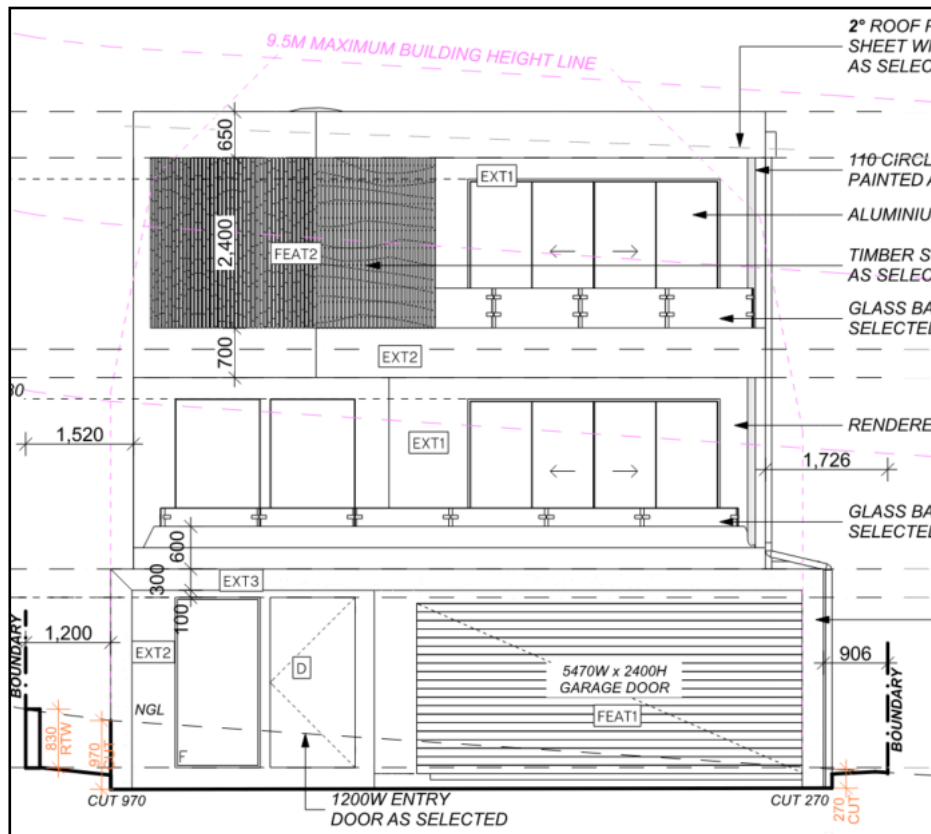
Front (southern) elevation - 54 Daunt Avenue - Demonstrating the numerically non-compliant side setback sections (Source: Prime Design)
